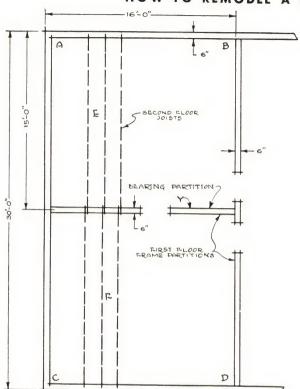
Part of First-Floor Plan Showing How Bearing Partition Supports Second-Floor Joists (Directly Above Area in Fig. 114)
